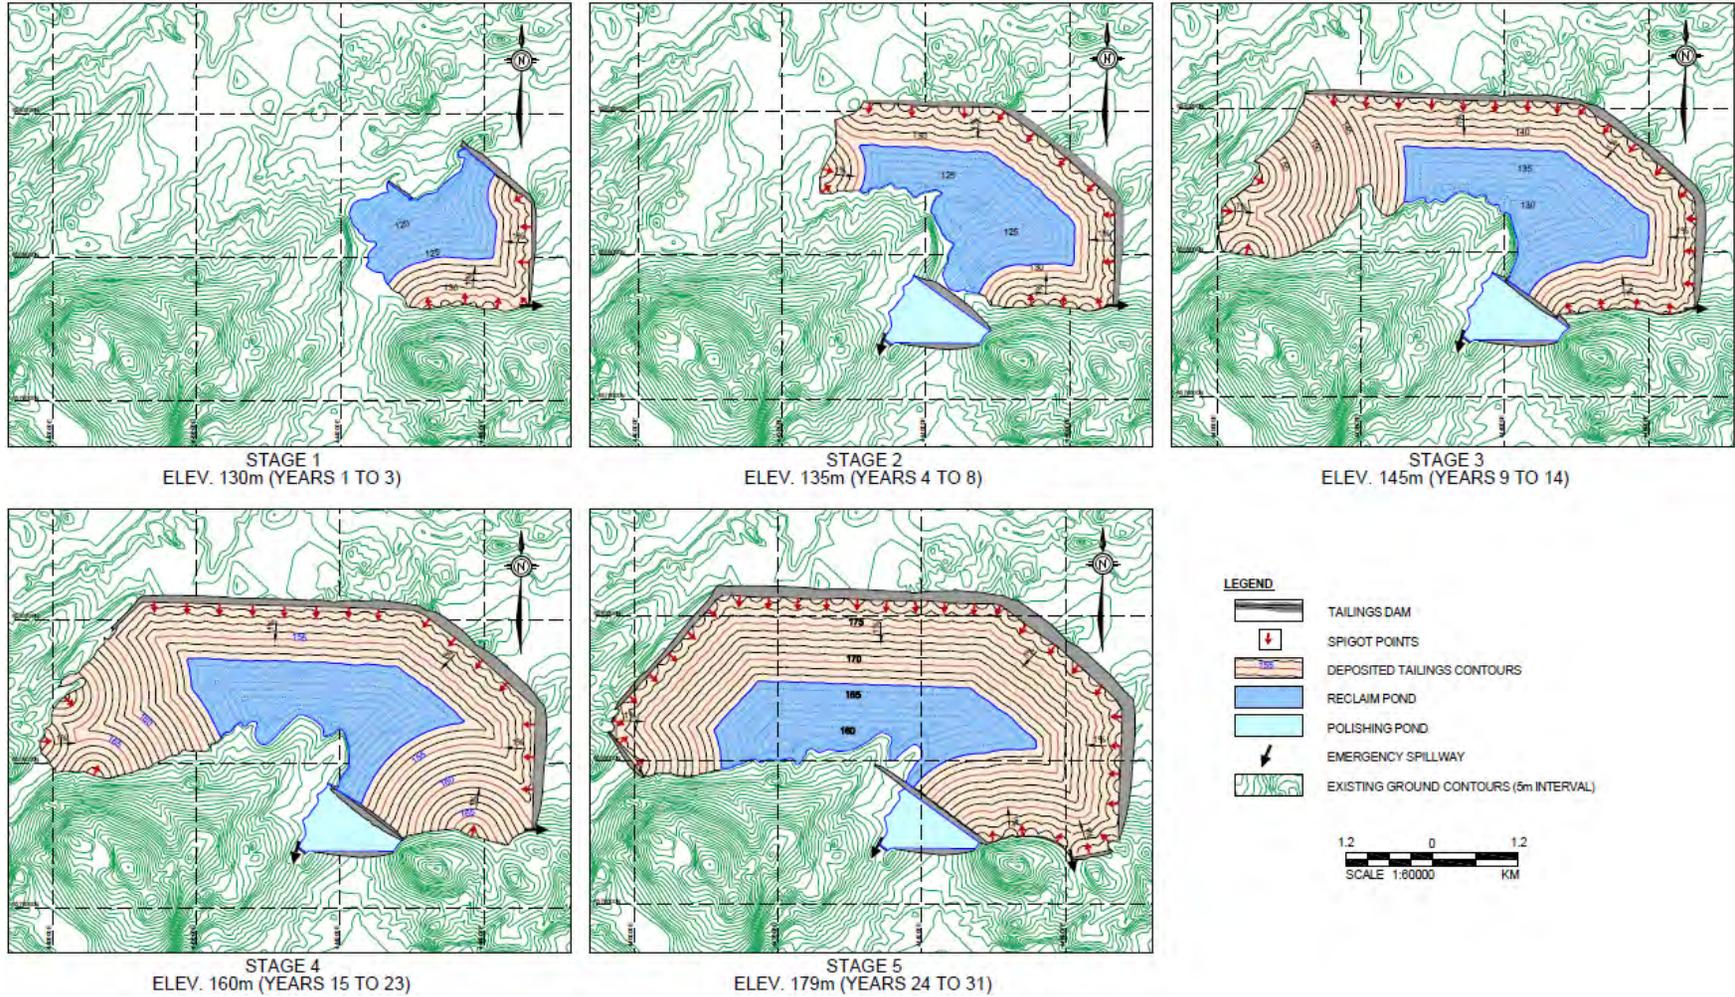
Proposed tailings deposition plan and dam construction staging
